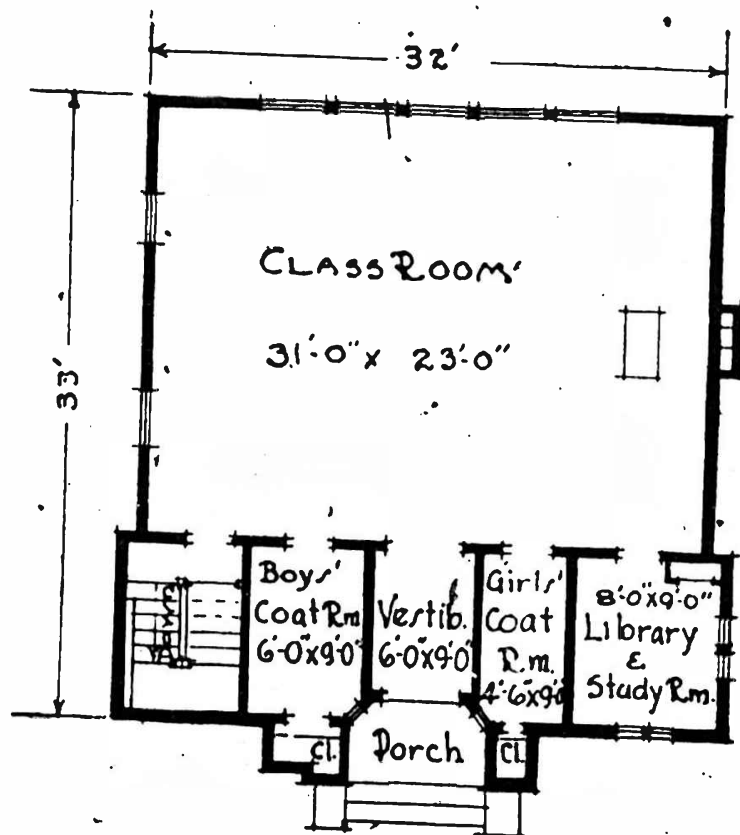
Floor plan, Crossroads School, Macou Co., Ill.
